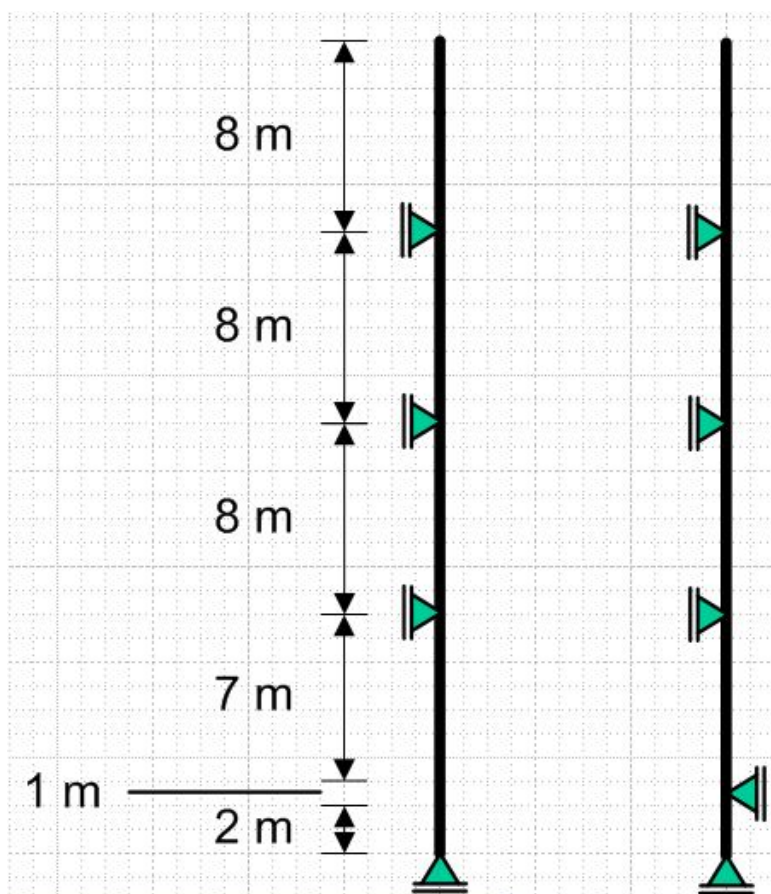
Left: Structural scheme without underwater concrete floor; Right: Structural scheme with underwater concrete floor
